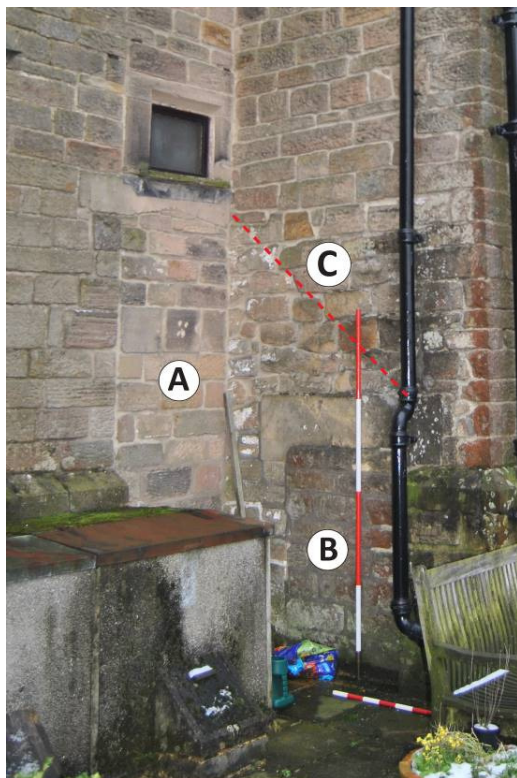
Features related to former stair at Bay 7; viz. A; blocked door, B; blocked door and C; roof scar.
